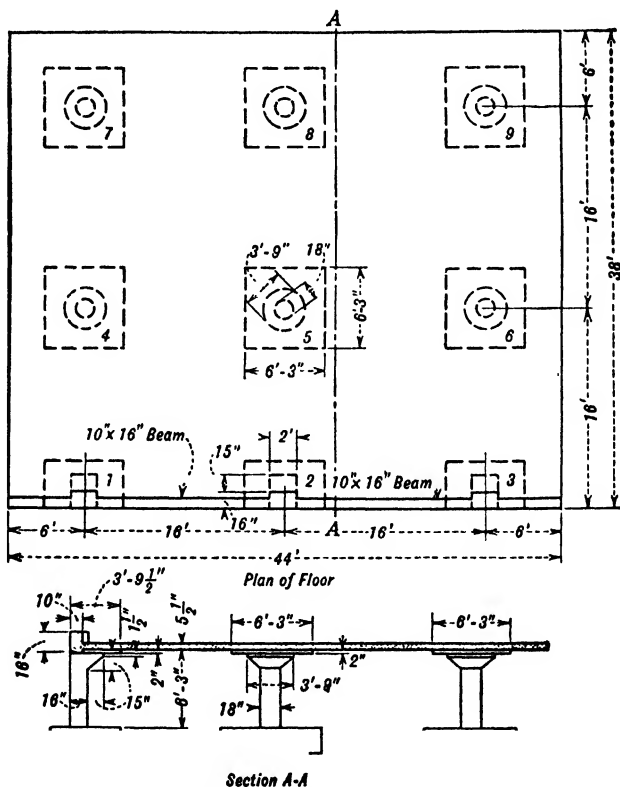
Concrete Dimensions, Slab J. (See p. 99.)
